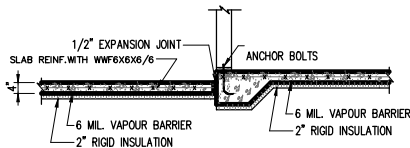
DETAIL TYPICAL SECTION THRU EXTERIOR OF UNITS WALL
